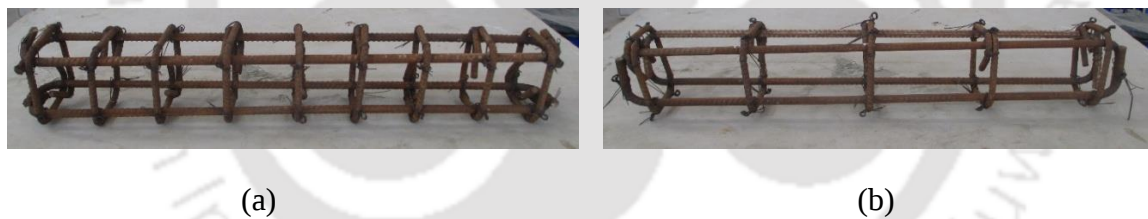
Reinforcement cage for (a) conventional concrete specimen (b) HyFRC specimen
